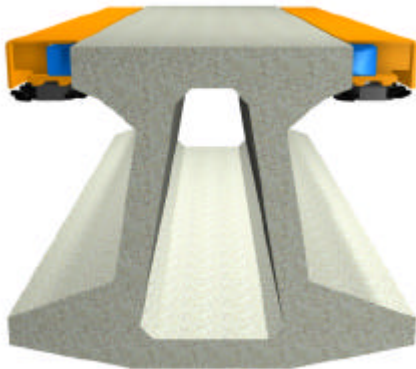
Cross section of the Hybrid Guideway Girder, type I, developed for Shanghai (CBP)
